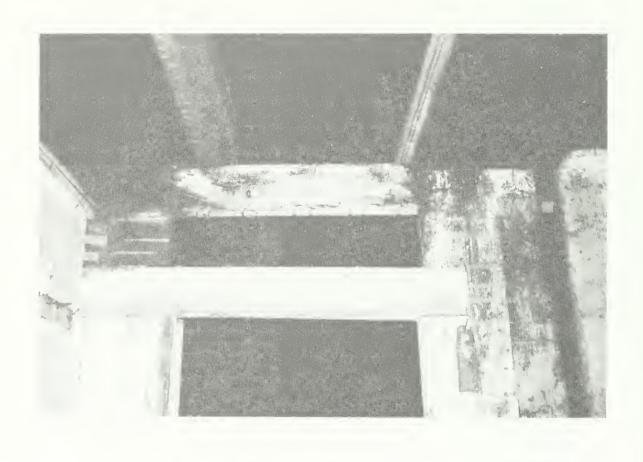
South servant's room (Room 207), north end of east wall, whitewash evidence of former doorway.
